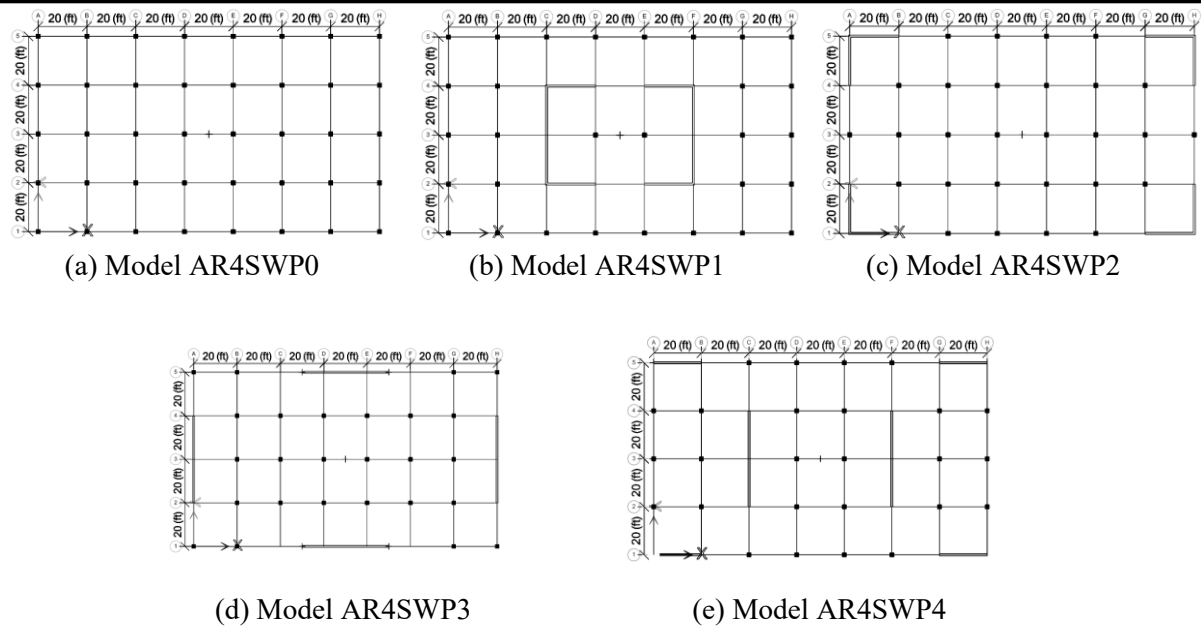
Shear-wall layout plans for aspect ratio 1:1.75
